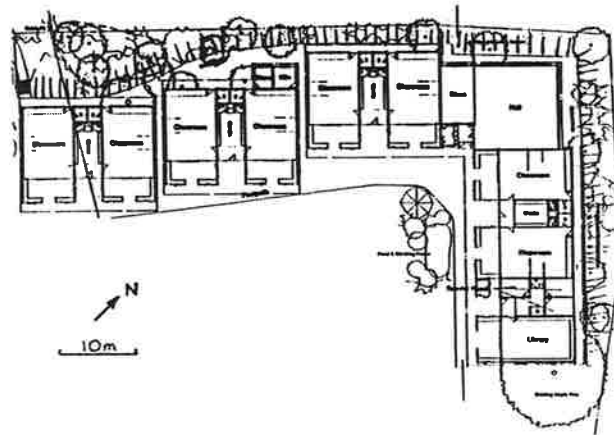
Site plan of King Alfred Lower School Re-development. The buildings are formed in an 'L' shape around an open playing field, the front facades being either SE or SW orientated, the rear overshadowed by trees
